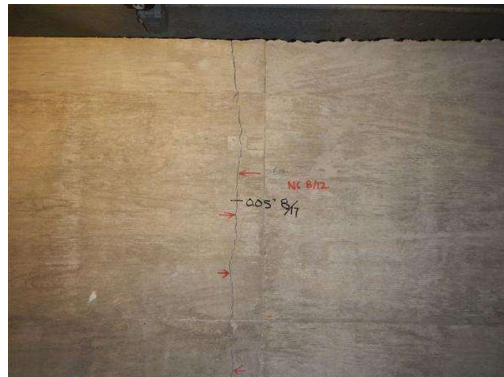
Typical vertical cracking on the concrete ballast block in Span 5Z.
